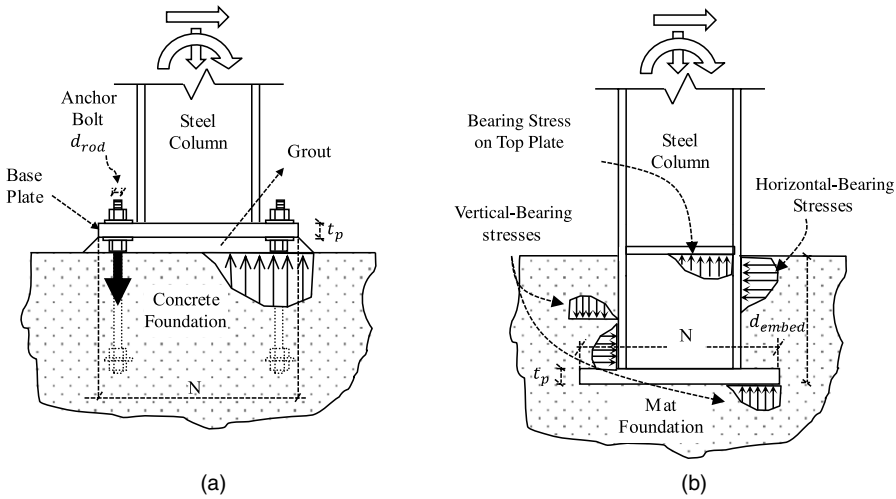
(a) Exposed base plate connection typical of low-rise construction and (b) embedded base plate connection typical of mid- to high-rise construction.
